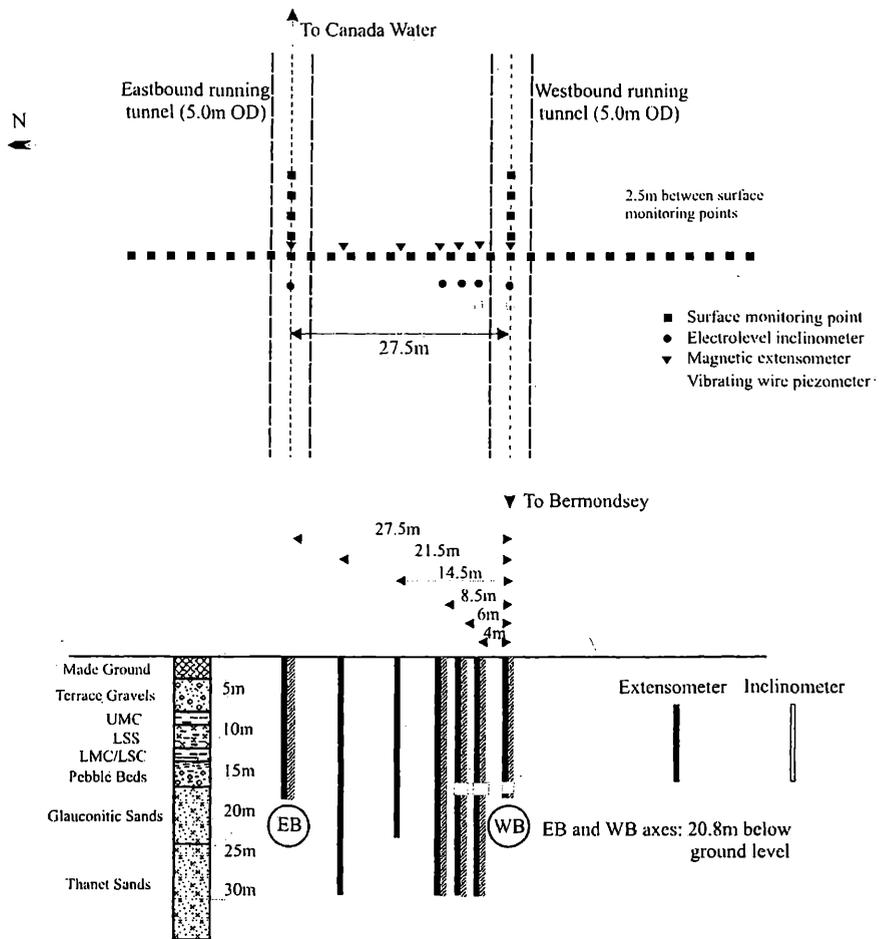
The soil profile, tunnels and instrumentation at Southwark Park greenfield site
